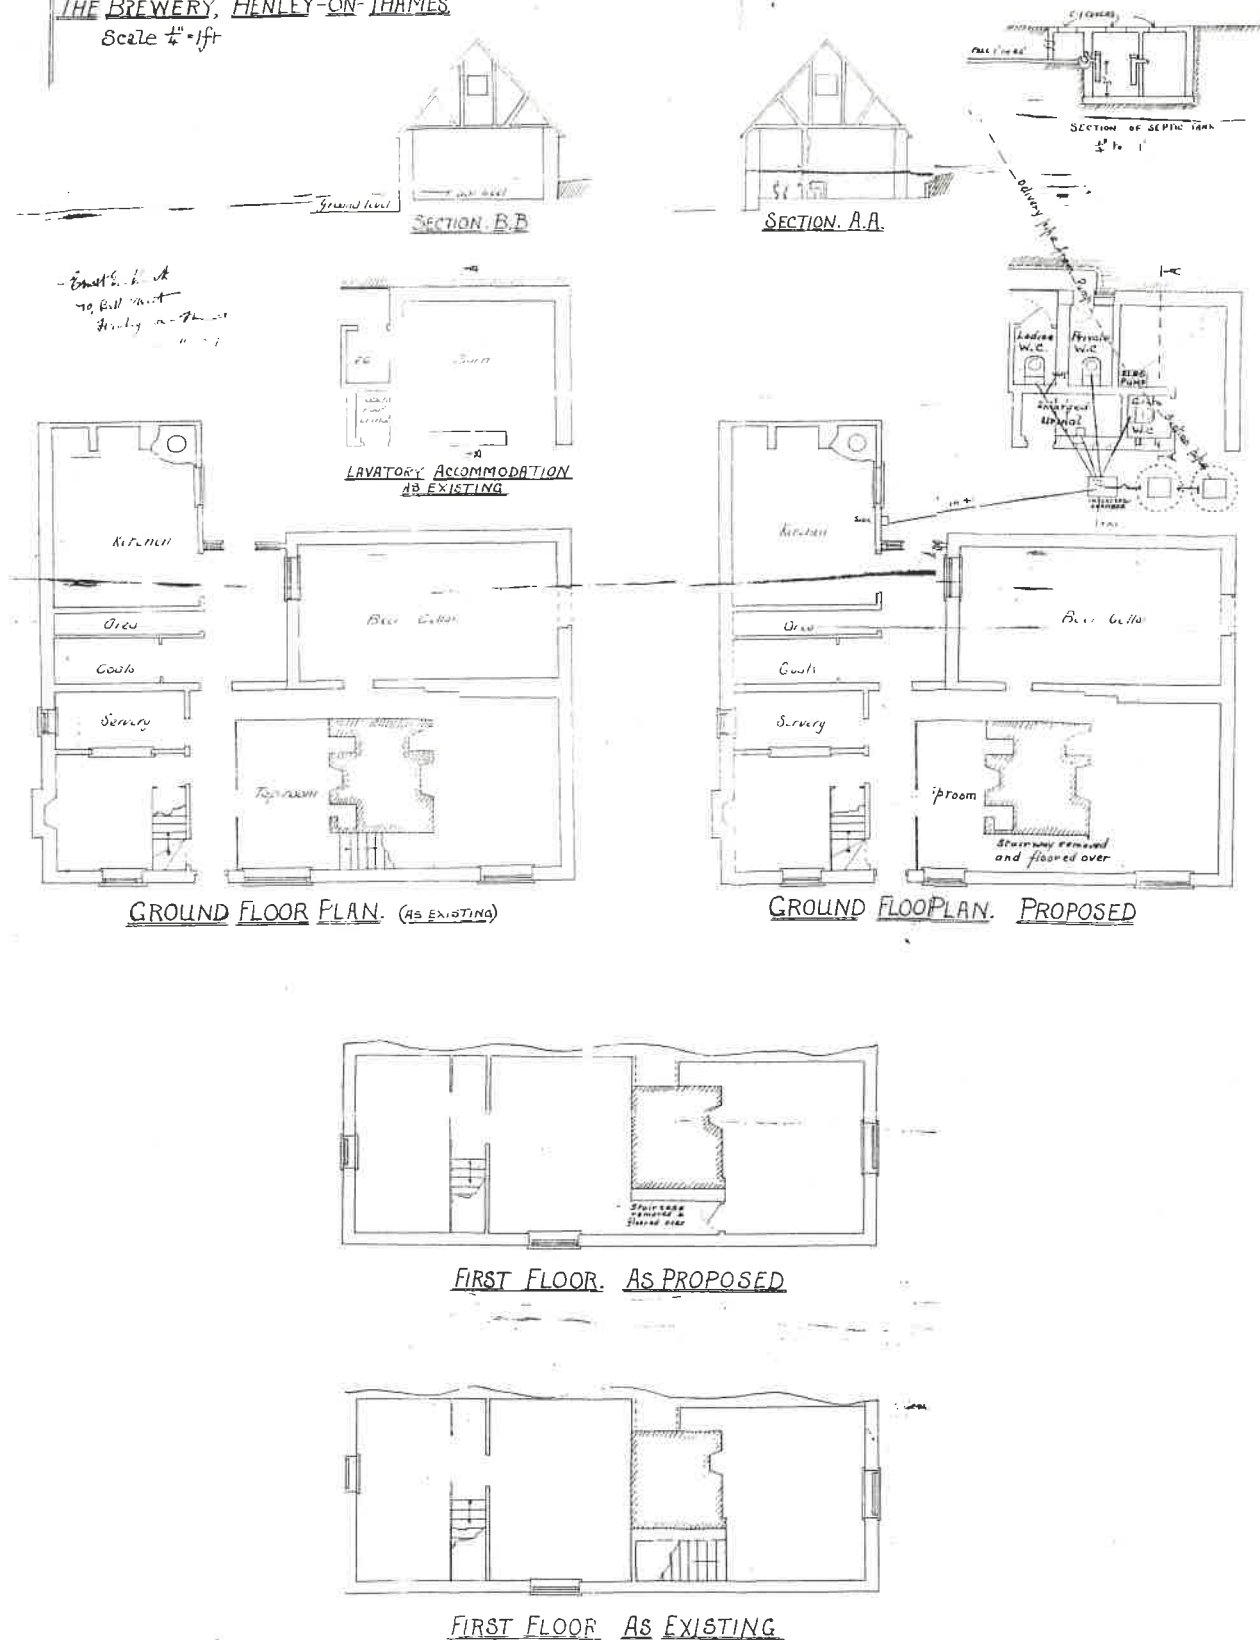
1949 planning application detailing proposed works at the Half Moon.
